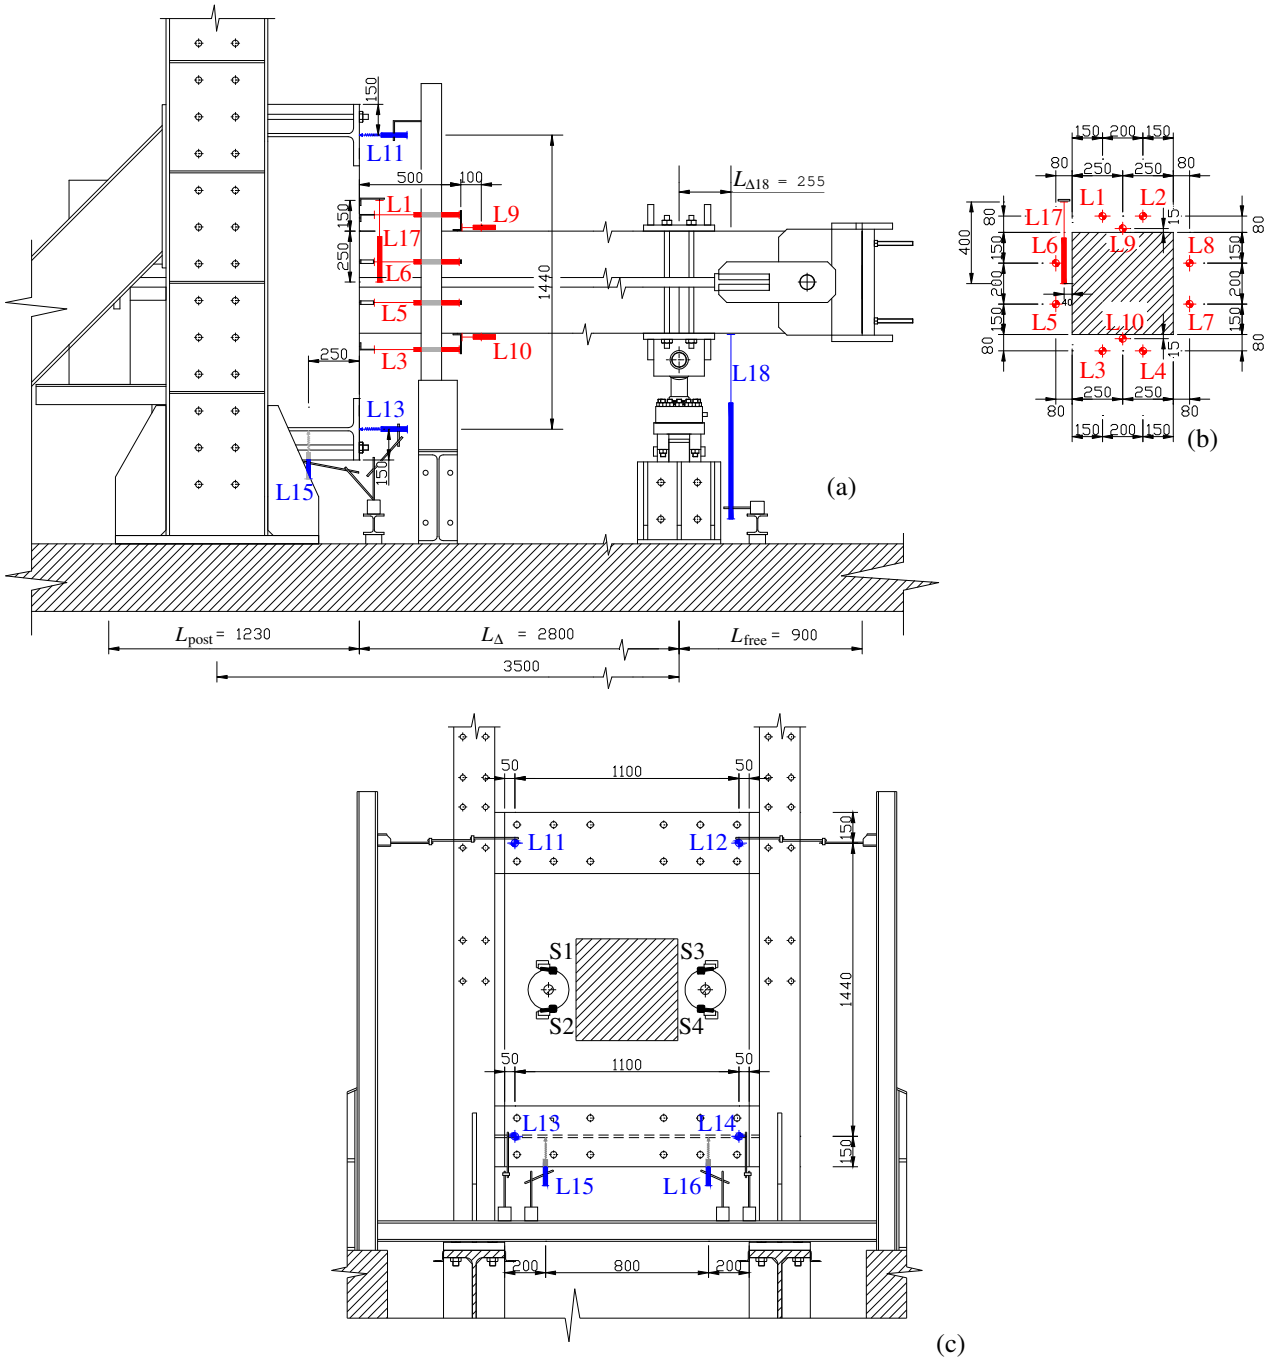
Positions of the linear displacement transducers: (a) side view, (b) column cross-sectional view and (c) frontal view of the test setup. Dimensions in mm
